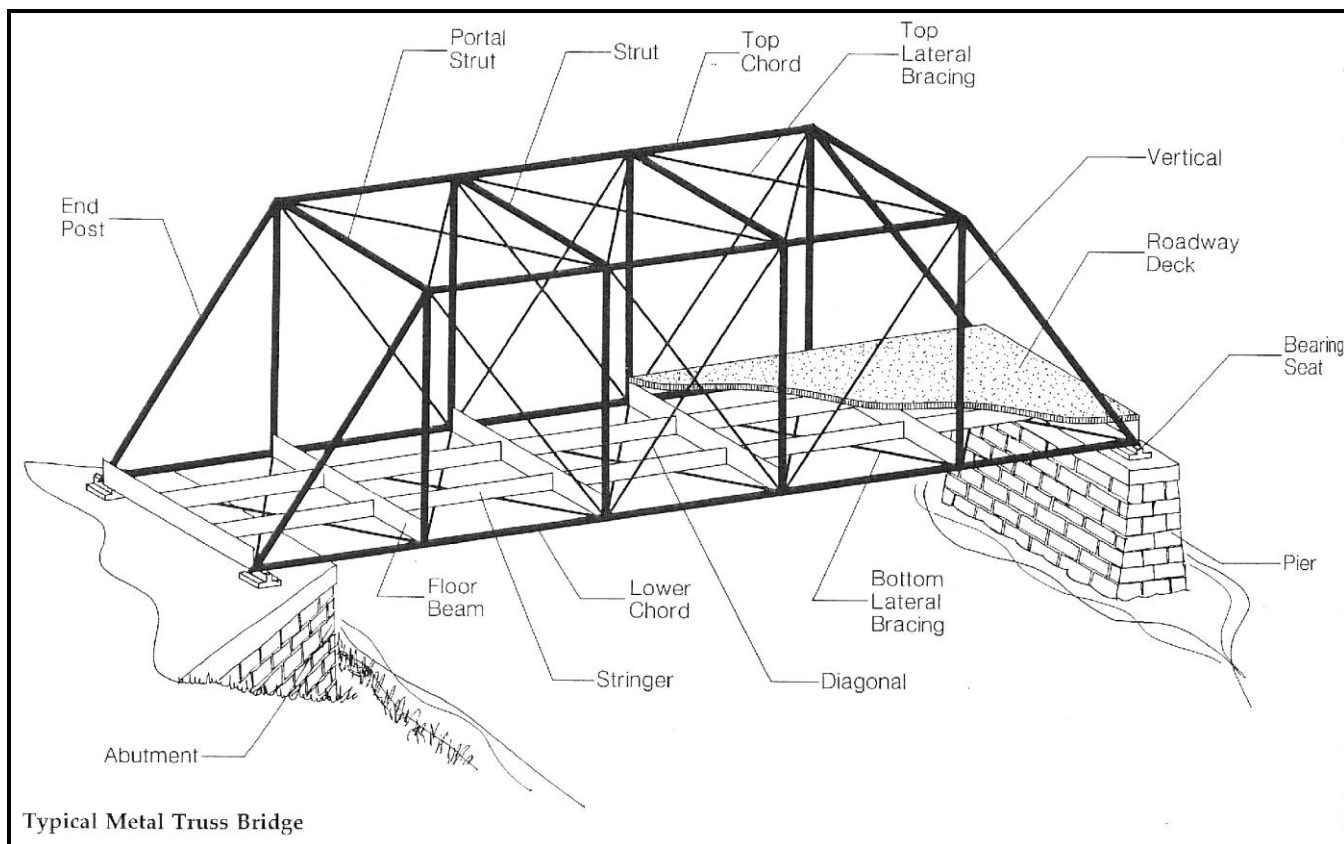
Typical Example of the Construction Methods of a Metal Truss Bridge²⁵⁴
